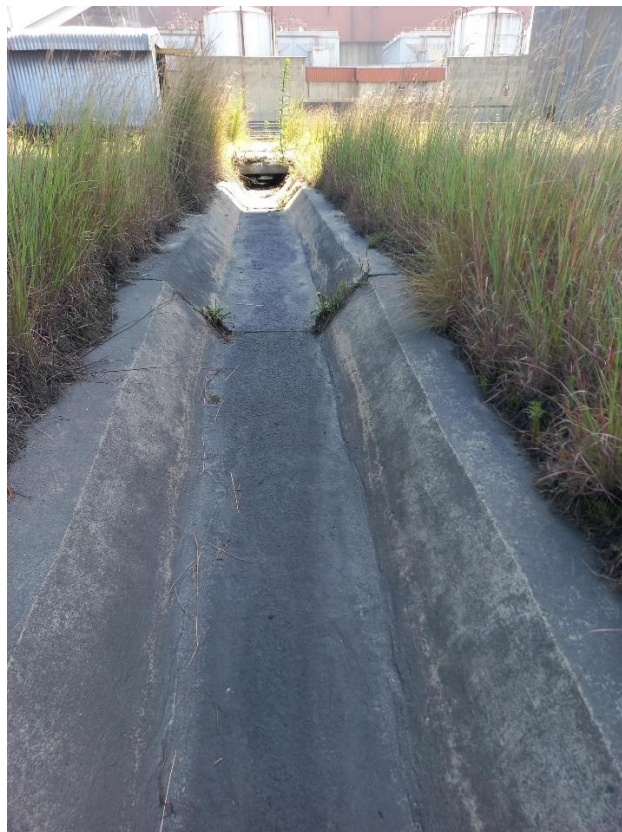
Concrete V-Drains from Silt Traps to Coal & Ash Settling Ponds
